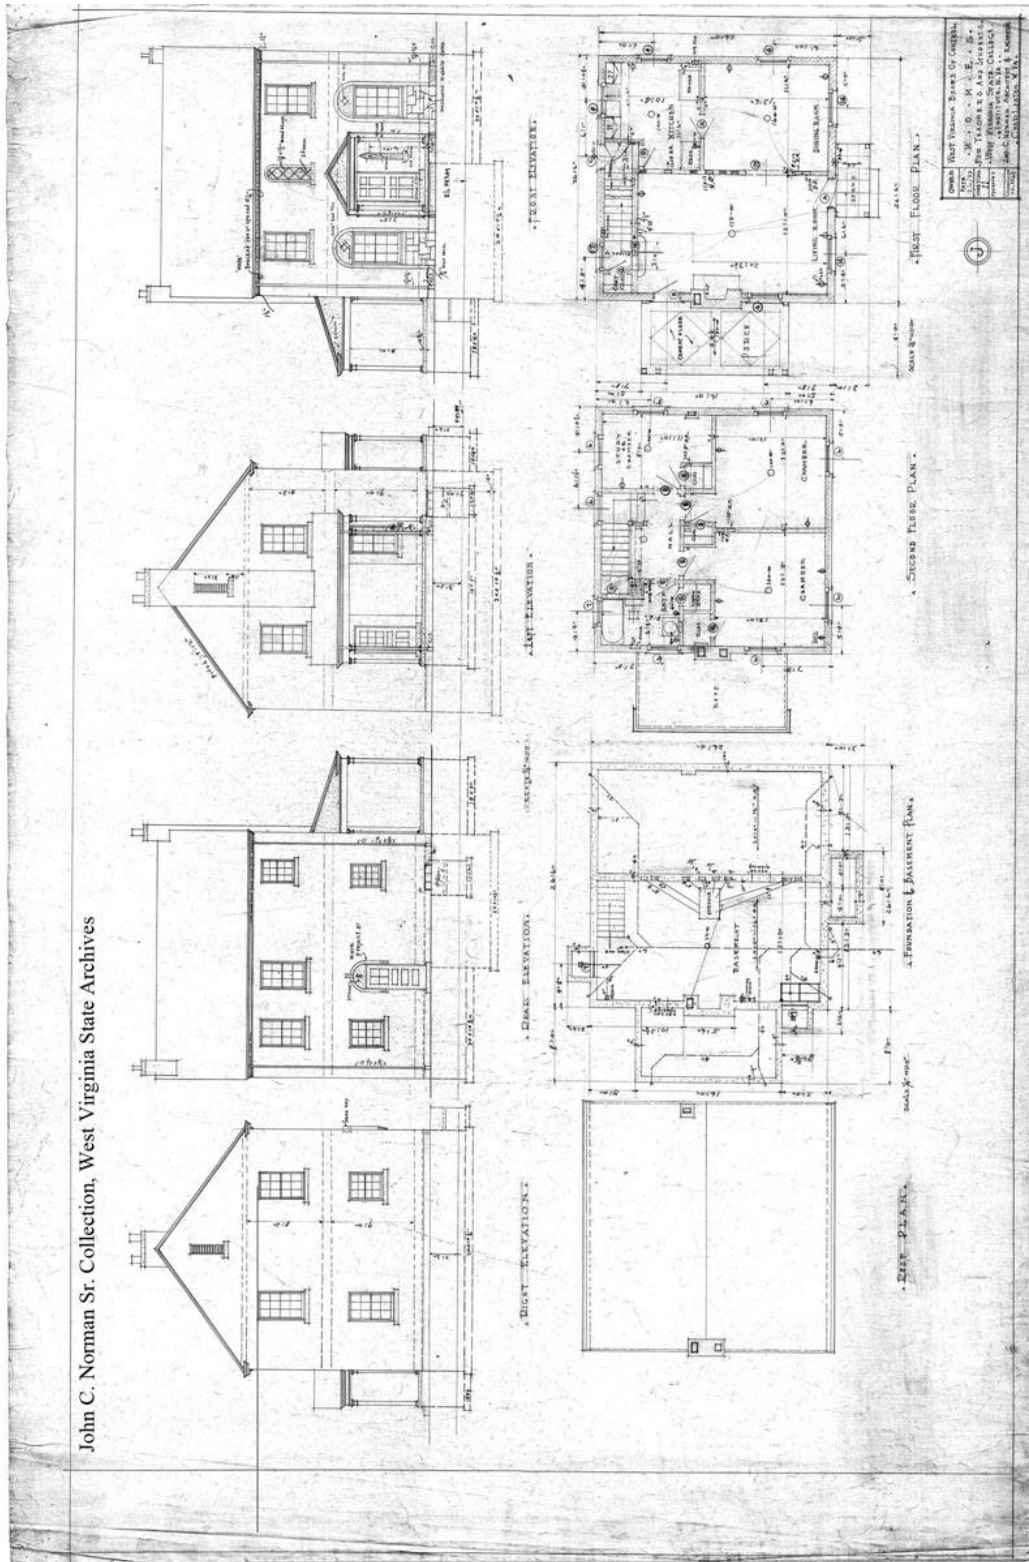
Faculty House J Floor Plan, Courtesy of the West Virginia State Archives, John C. Norman Sr. Collection
